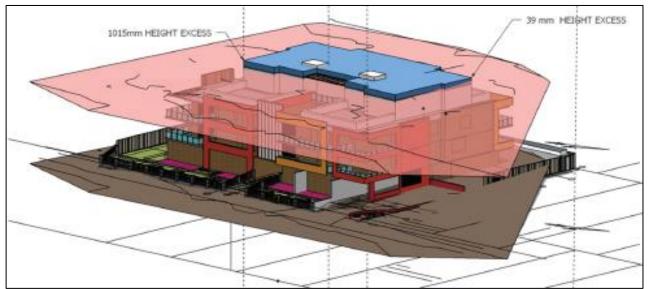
Proposed western view of the areas exceeding the proposed building height standard.
